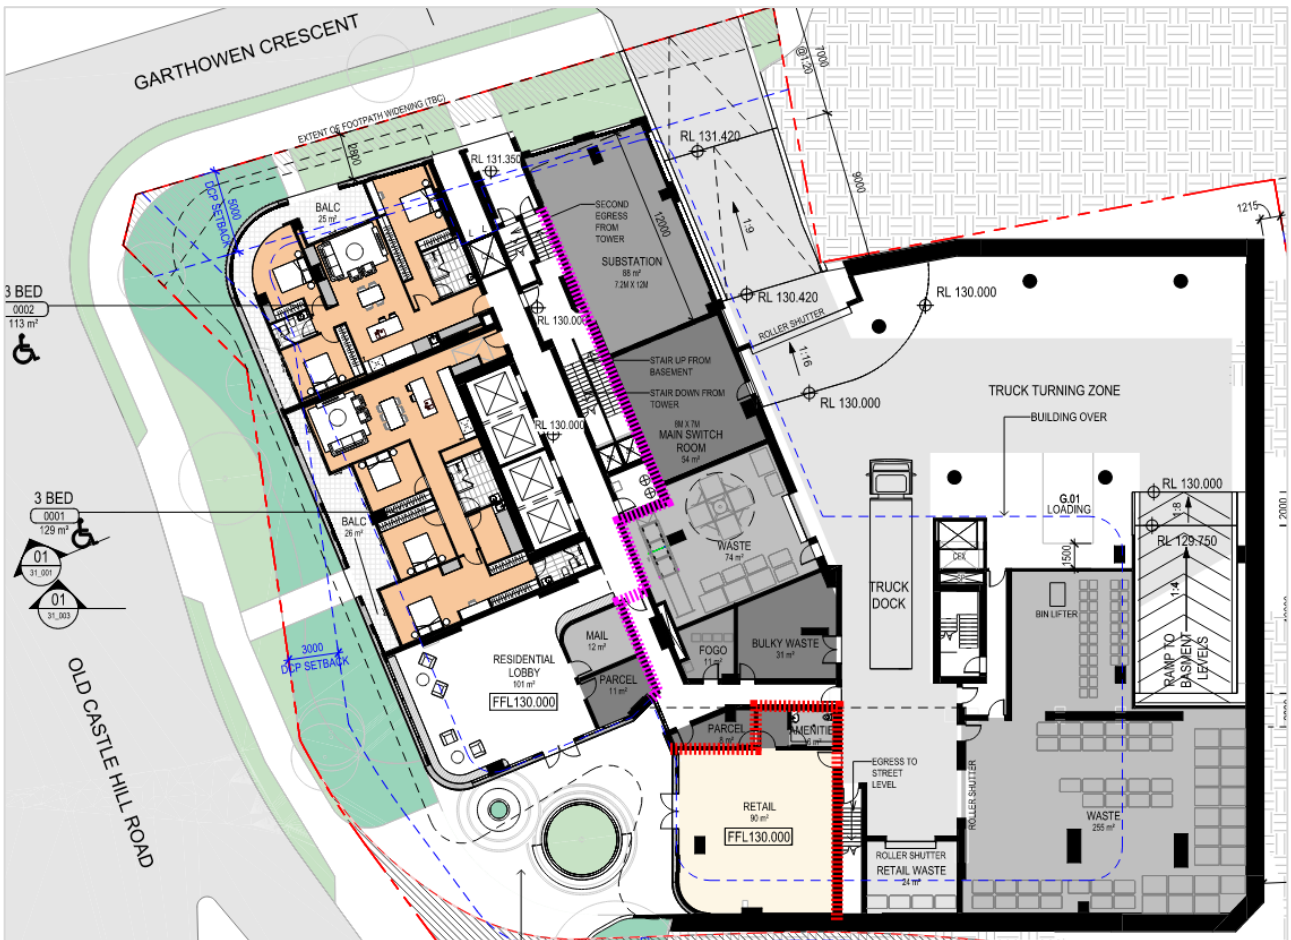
Ground Floor Fire Compartments show the fire walls to provide residential, retail tenancy and loading dock / car park fire compartment.
